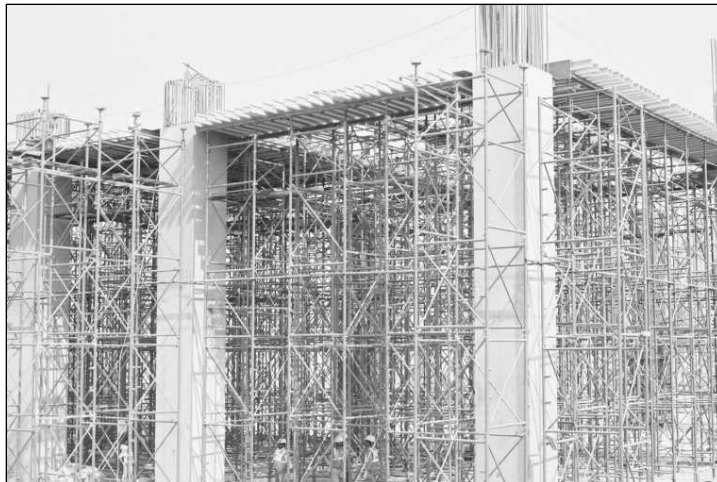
Beam and Slab Formwork Under Preparation at Delhi International Airport.
